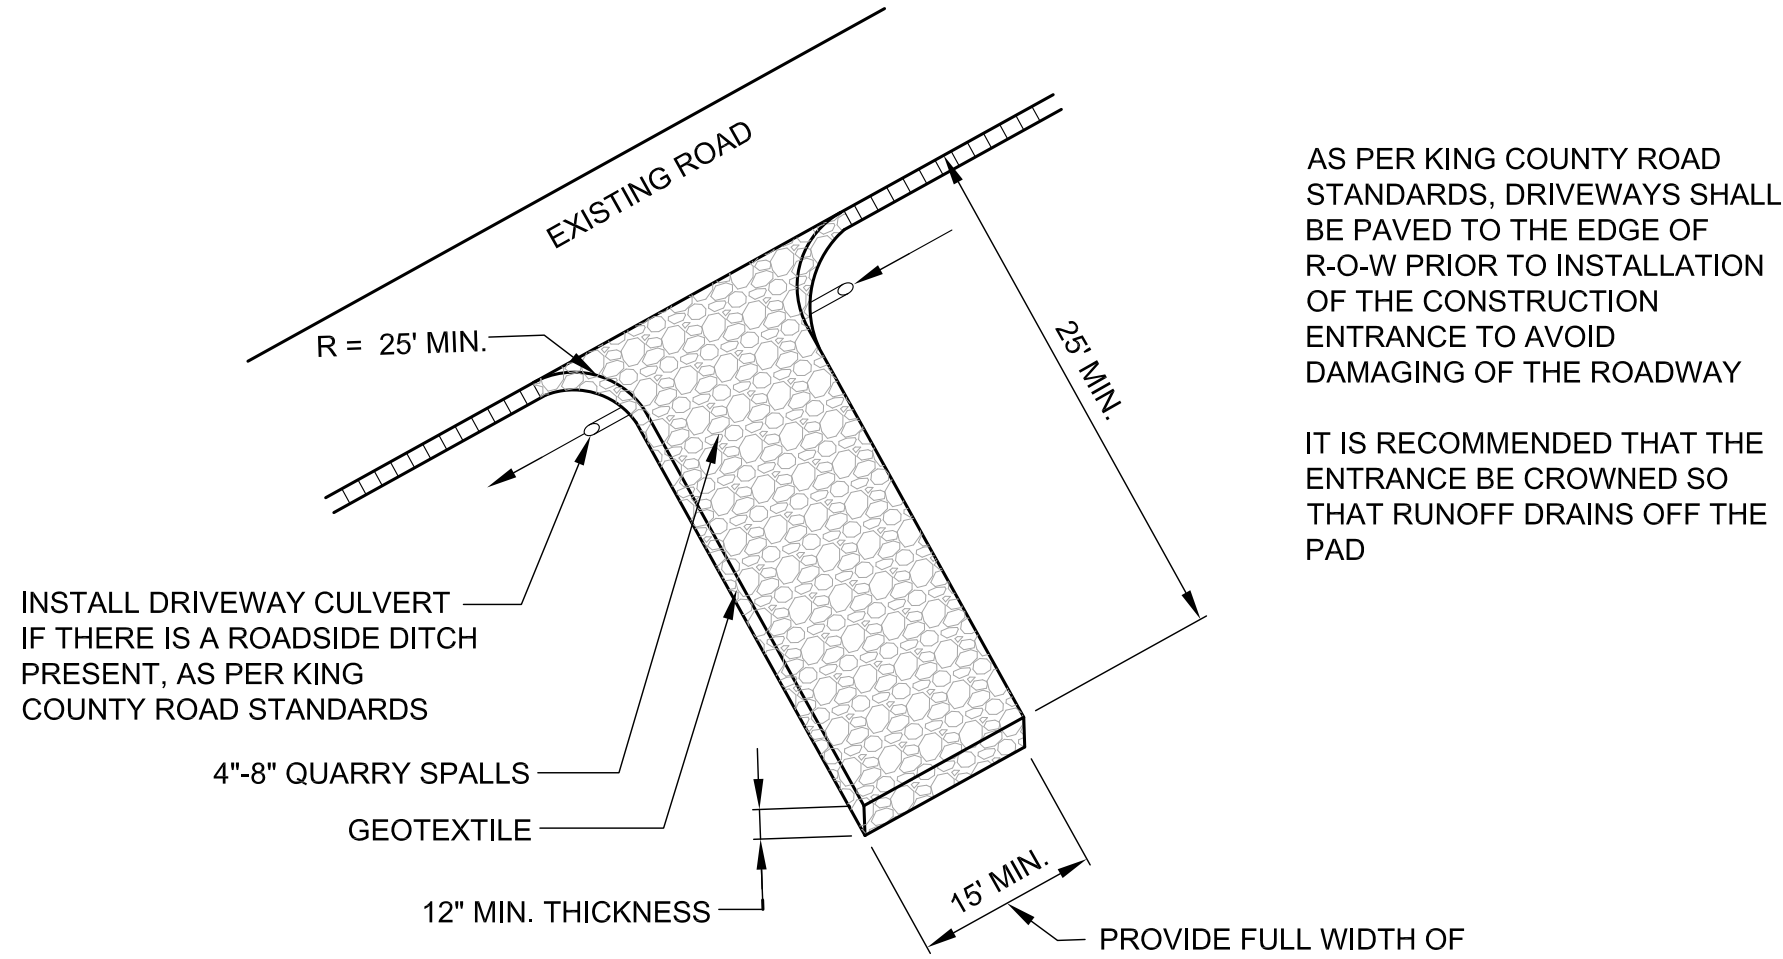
A STABILIZED CONSTRUCTION ENTRANCE DETAIL
